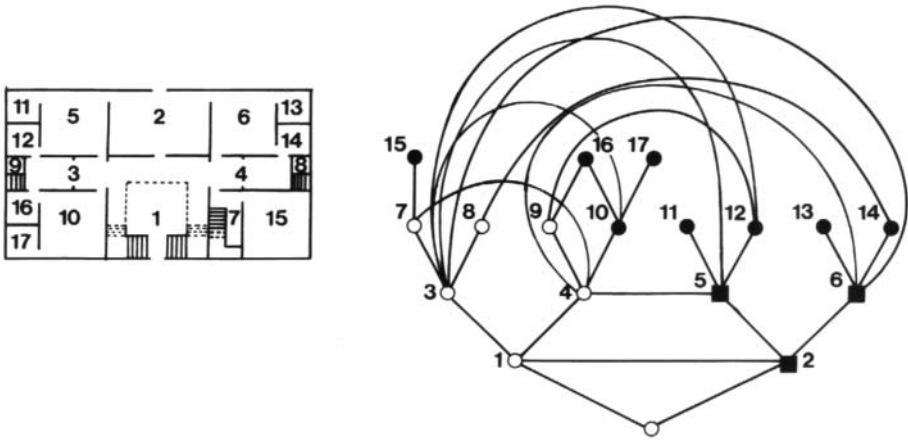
Coleshill, outline ground-floor plan and access map. Rooms identified after Girouard 1980: 123. 1 Hall and Great Stairs; 2 Great parlour; 3 South lobby; 4 North lobby; 5 Withdrawing chamber; 6 Bedchamber; 7 Basement stairs; 8 North stairs; 9 South stairs; 10 Bedchamber; 11, 12 Closets; 13, 14 Closets; 15 Steward's room; 16, 17 Servant's room and closet
